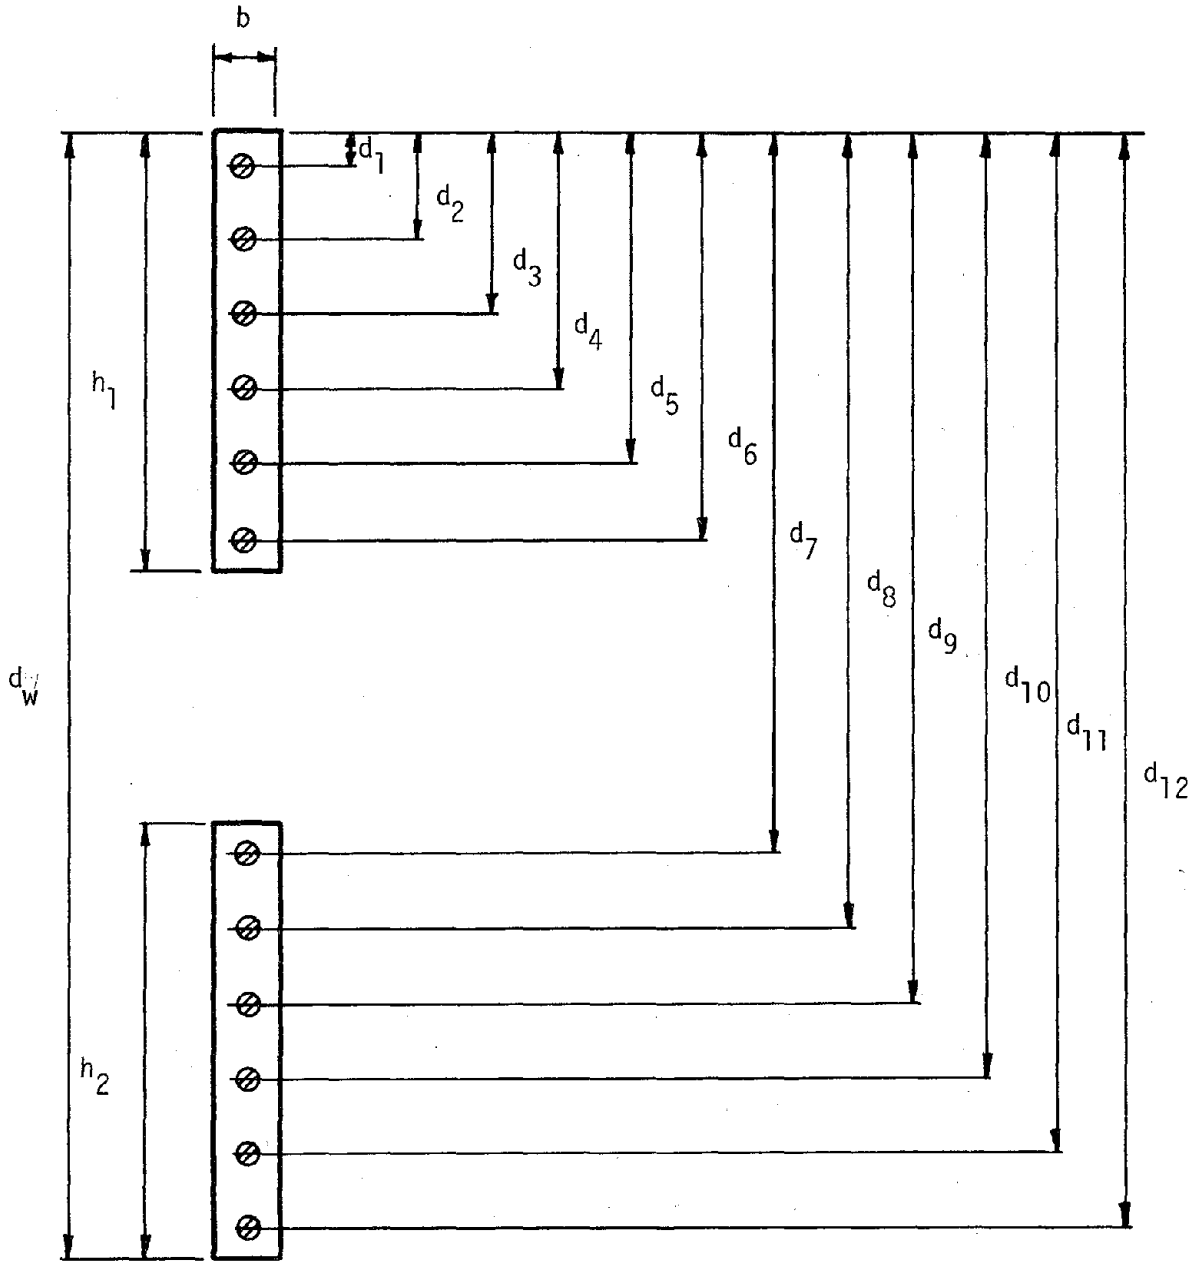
Section Used to Calculate Maximum Base Moment of One Wall as a Cantilever
